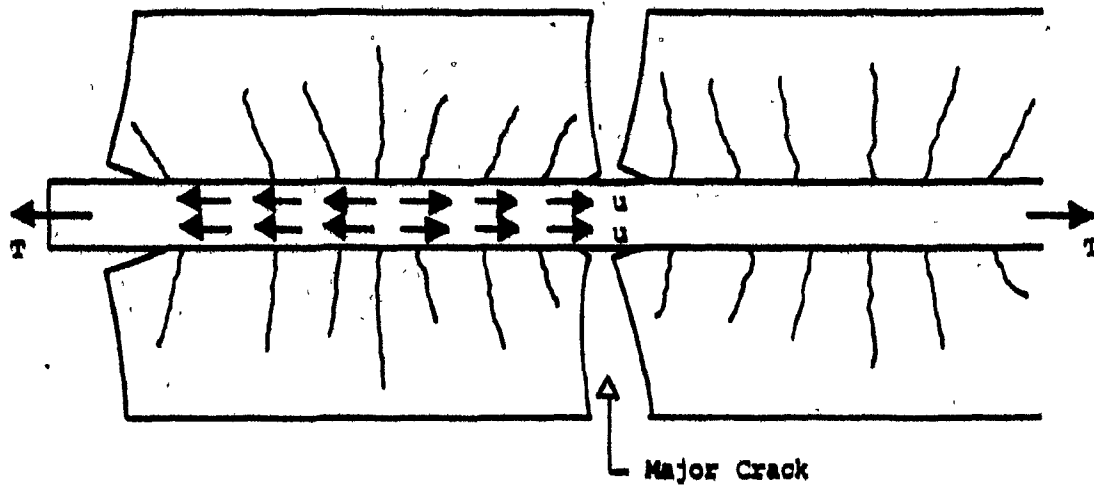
Deformed Concrete Between Transverse Cracks of a Tension Member (16)
